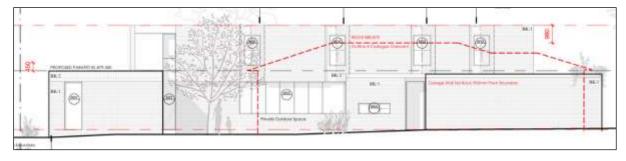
existing ground levels (black line) and proposed finished floor level (red line)
